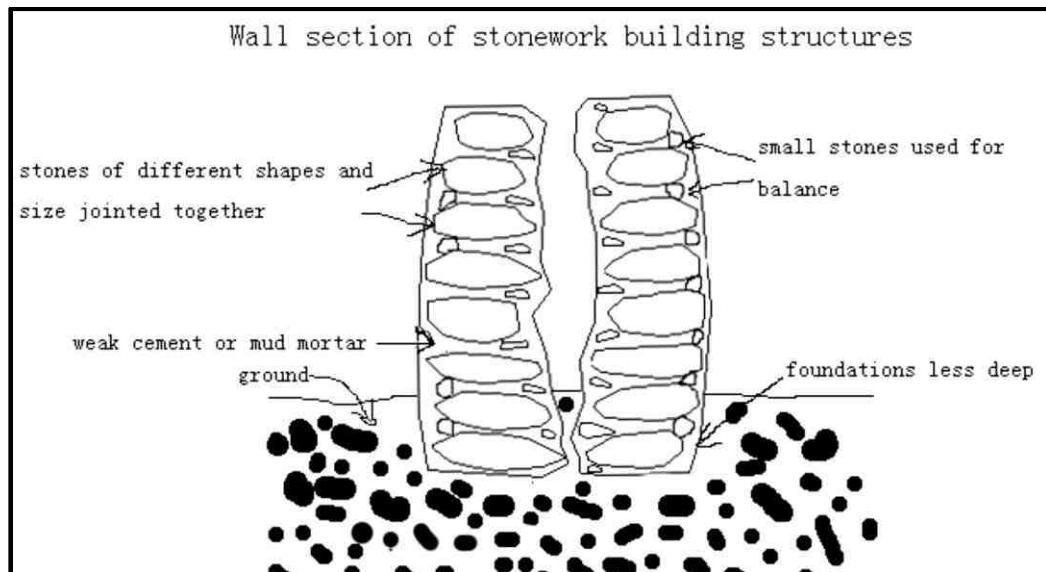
Cross section of a typical structure; round stones in walls with mud or weak cement mortar, shallow foundation, and weak mortar in foundation were used.
